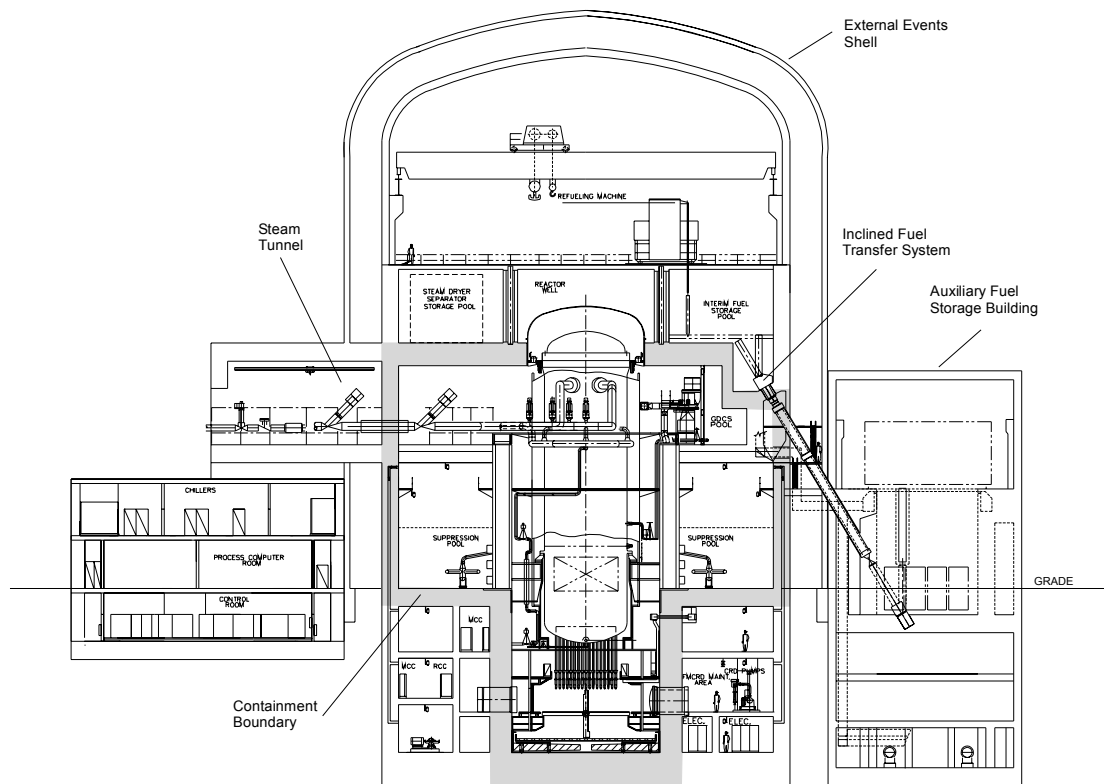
ESBWR reactor building arrangement, Section A-A, 0° - 180°.
